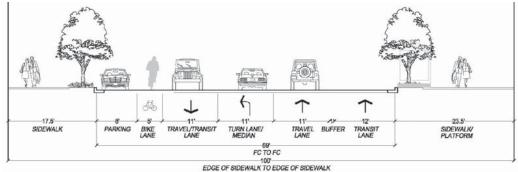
Recommended cross-section looking north with one-way transit north of 23rd Street S.
